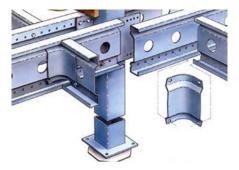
Typical components of an adjustable mezzanine in cold-formed steel (floor panels mounted on beam grid)
